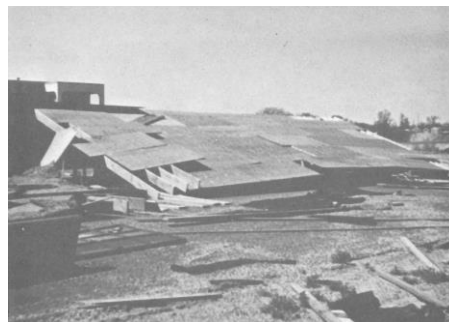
a) Wood diaphragm separated from supporting structure by extreme winds (Spangler 1979)
